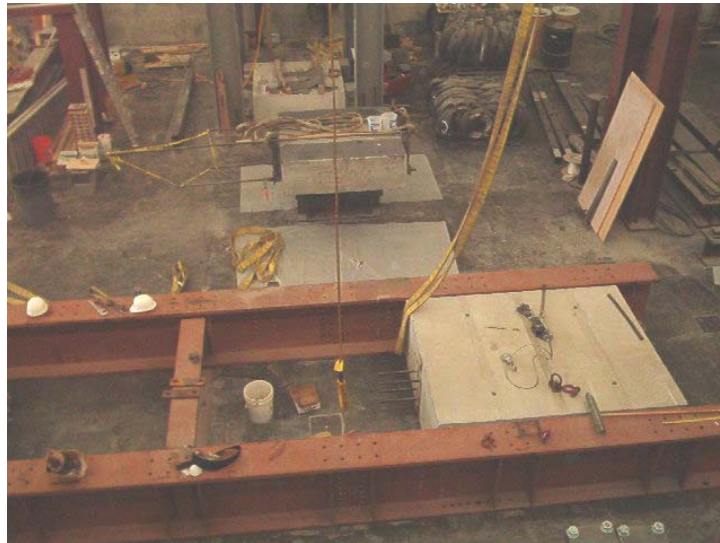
Aerial view of dead load reinforced concrete block wedged between girders
